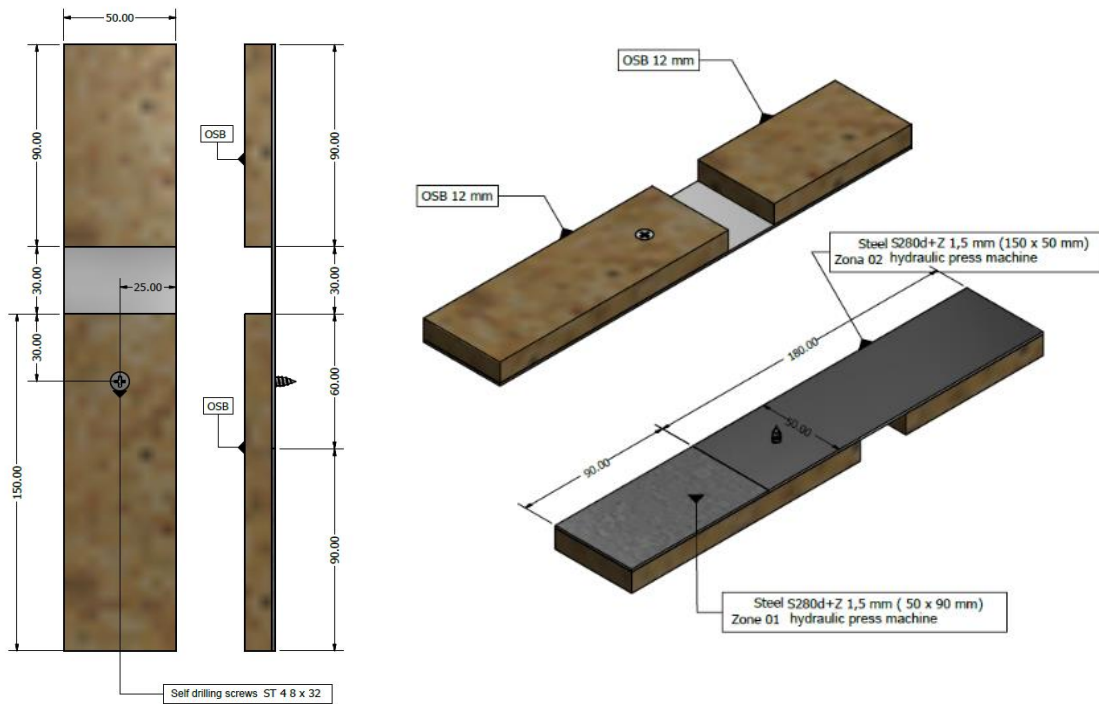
Test specimen of steel-OSB connection with ST 4.8.
